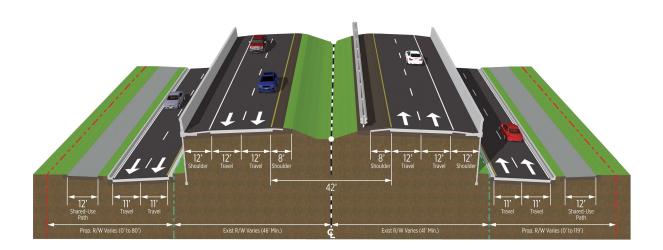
Segment 1 - Typical Section from 4th Street N to Brighton Bay Blvd NE; San Martin Blvd to San Fernando Drive
